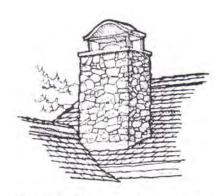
Decorative chimney caps can add interest to the roofscape.
